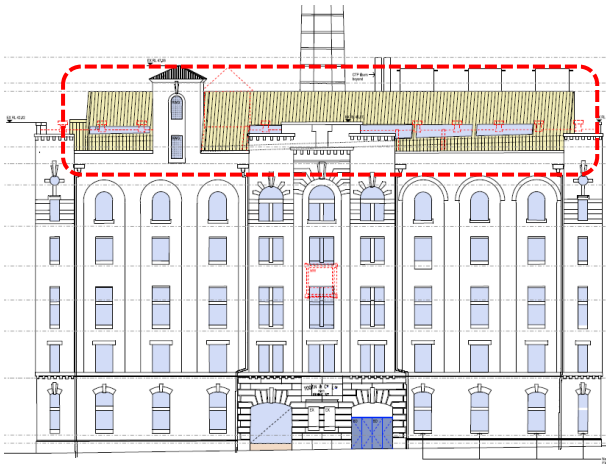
Proposed Level 6 when viewed from the south (facing southern elevation)
